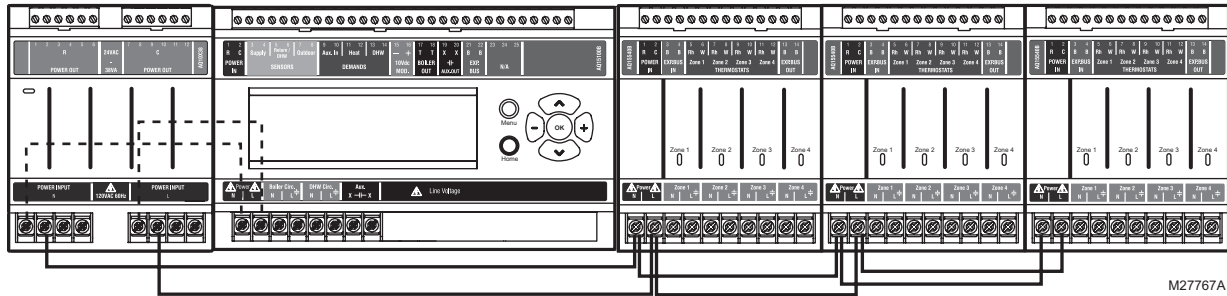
Alternate Connections for multiple Zoning Panels - daisy chain wiring.
